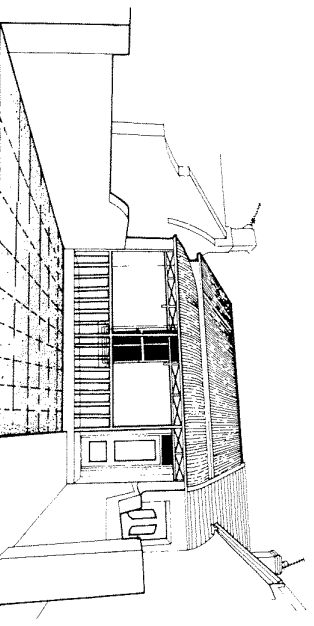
Front garden unfortunately replaced with paved parking area. However, this would have been worse if a carport had been built in front of the house.
